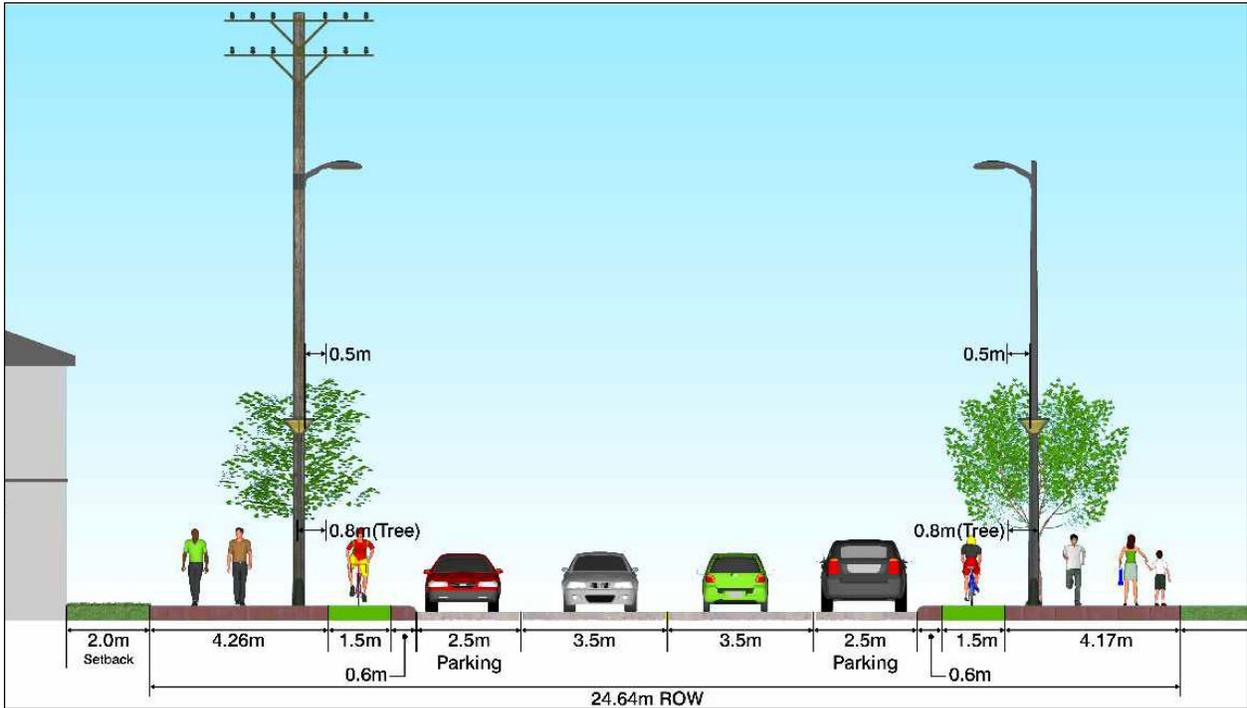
Alternative Design 5 Cross Section: Main Street between Hazel Street and Herridge Street
